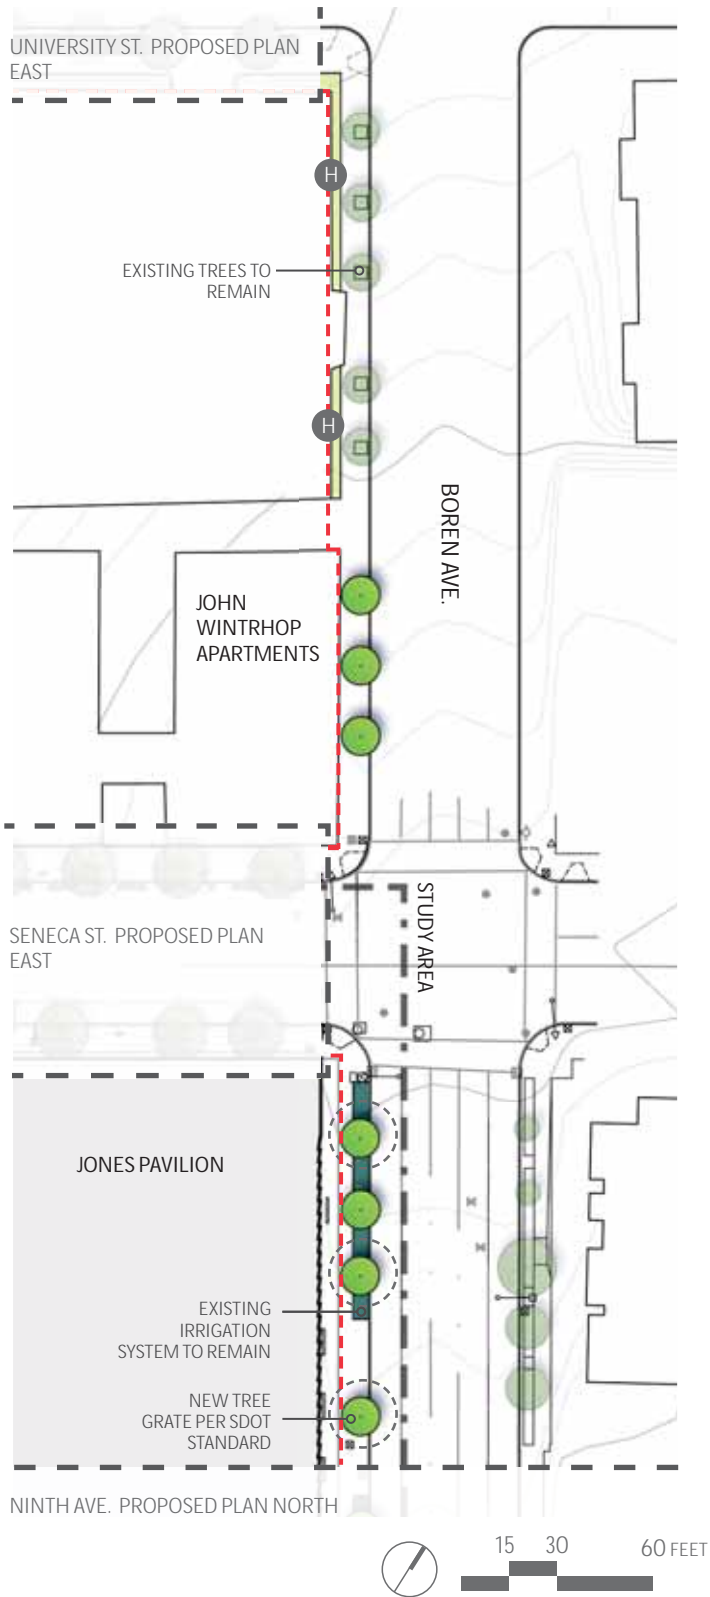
BOREN AVENUE PROPOSED PLAN NORTH
